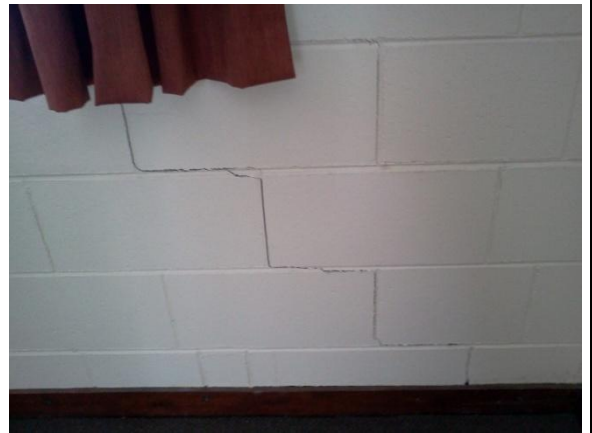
Up to 2mm wide step cracking along masonry joints
